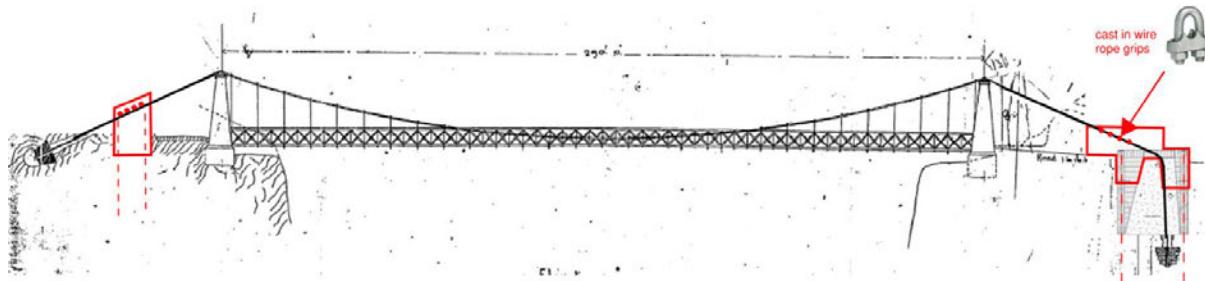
Concept for repair using existing cables with new anchor blocks shown in red
